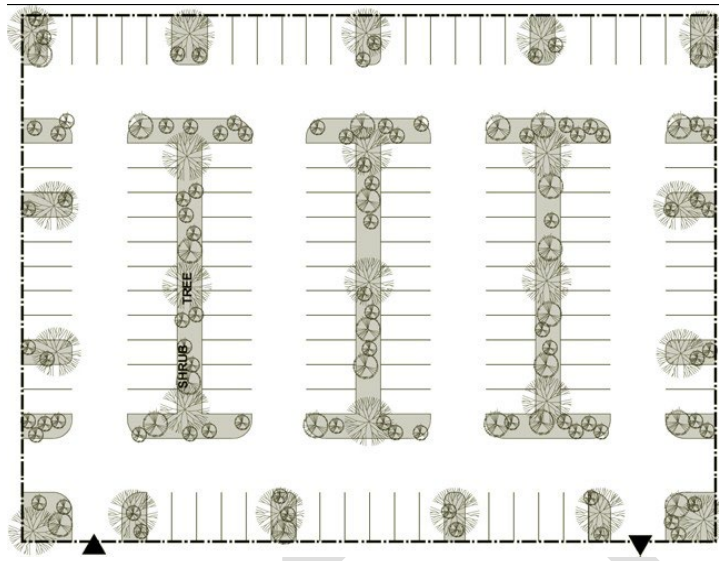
Example of an Interior Landscape Area (ILA) within a parking lot
